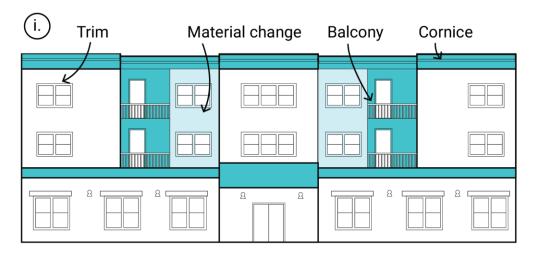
(B)(5)(a)(i): Façade detailing design elements
